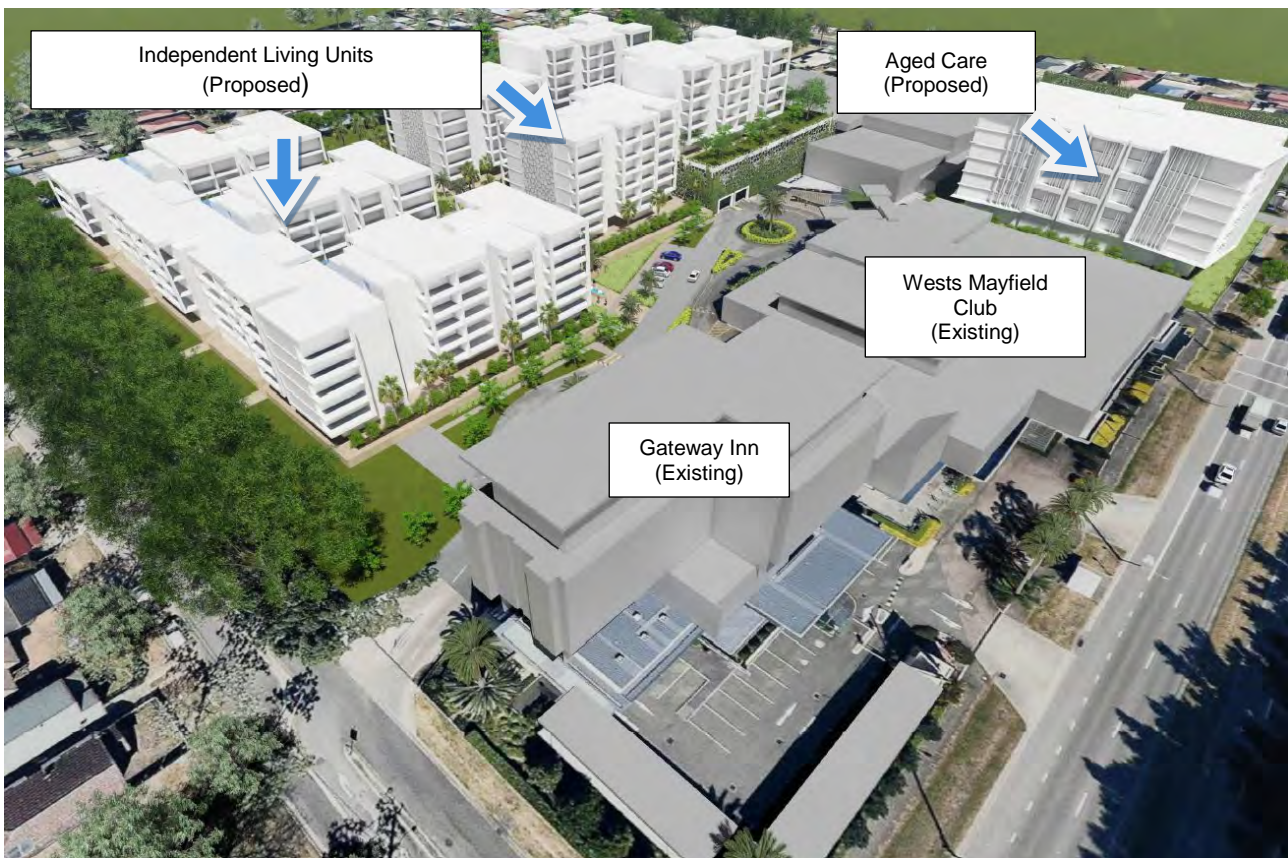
Oblique perspective of the proposed development as viewed from the north-east looking towards the south-west – EJE Architecture.
